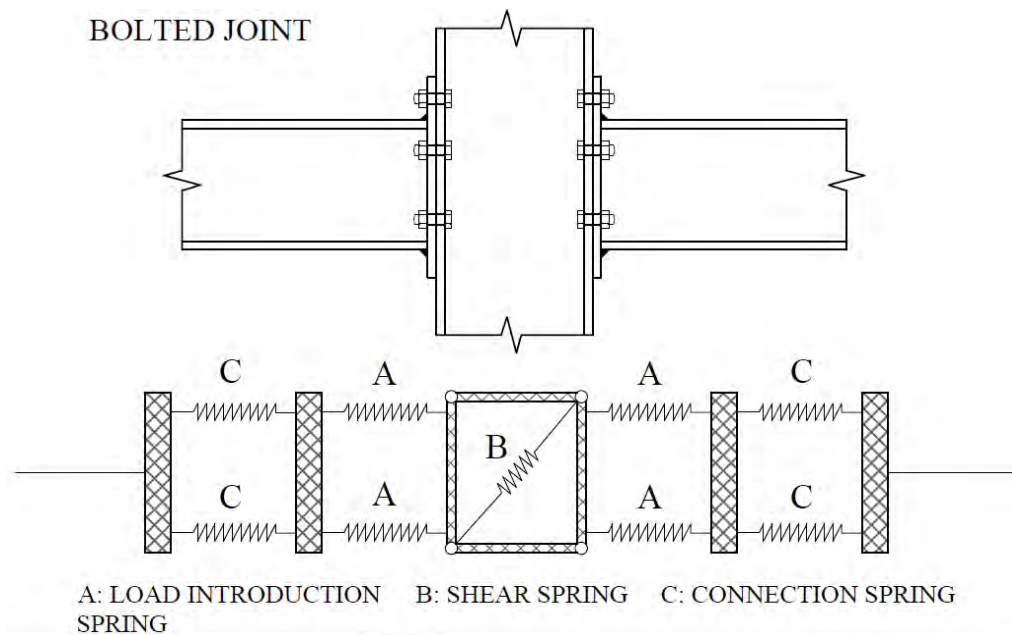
Mechanical model of a bolted joint (Tschemmernegg and Hummer, 1988)
